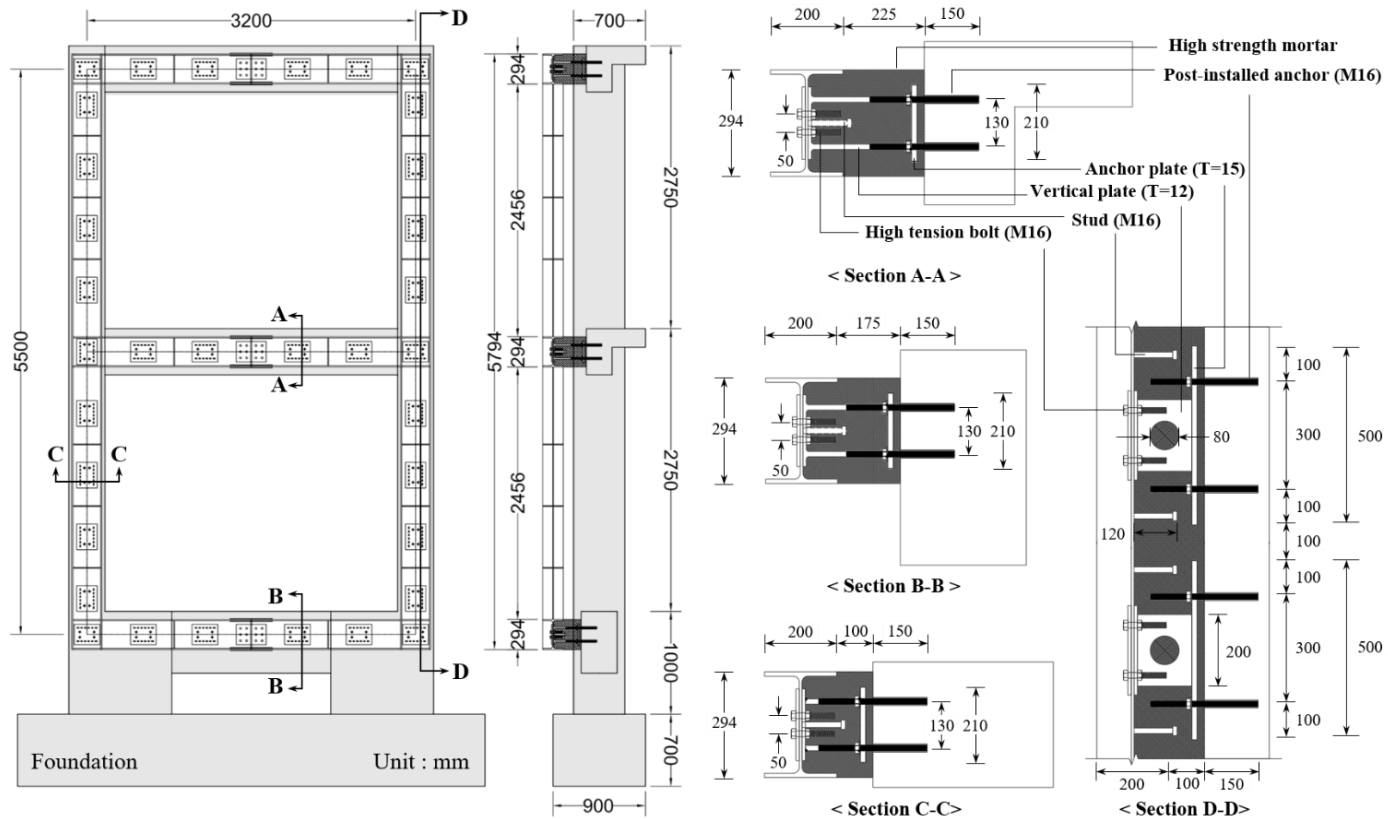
Dimensions and connection details of specimen retrofitted with external steel moment frame (EX-2)
